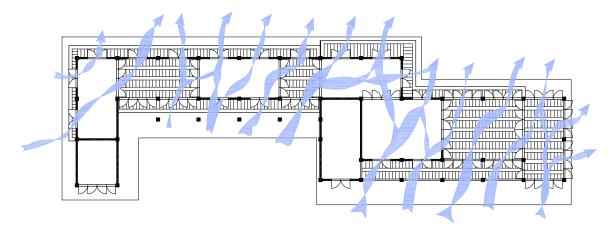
Natural Ventilation in a master's Building. Room location allows heat to vent from West of south to east of north.
